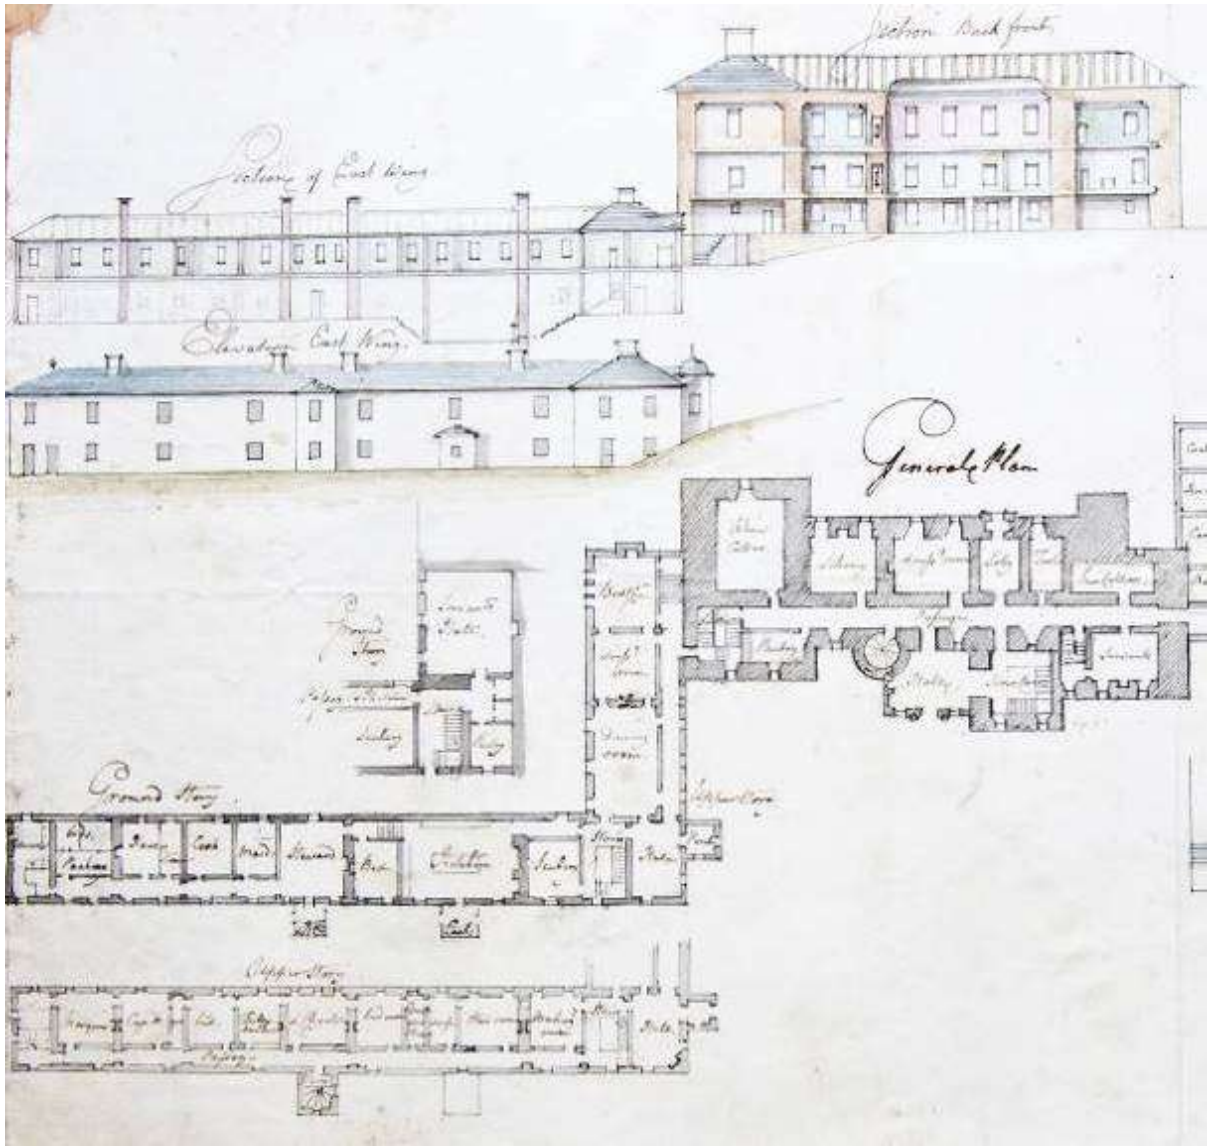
Measured plans showing joining wing of 1750 Courtyard: BCA.
